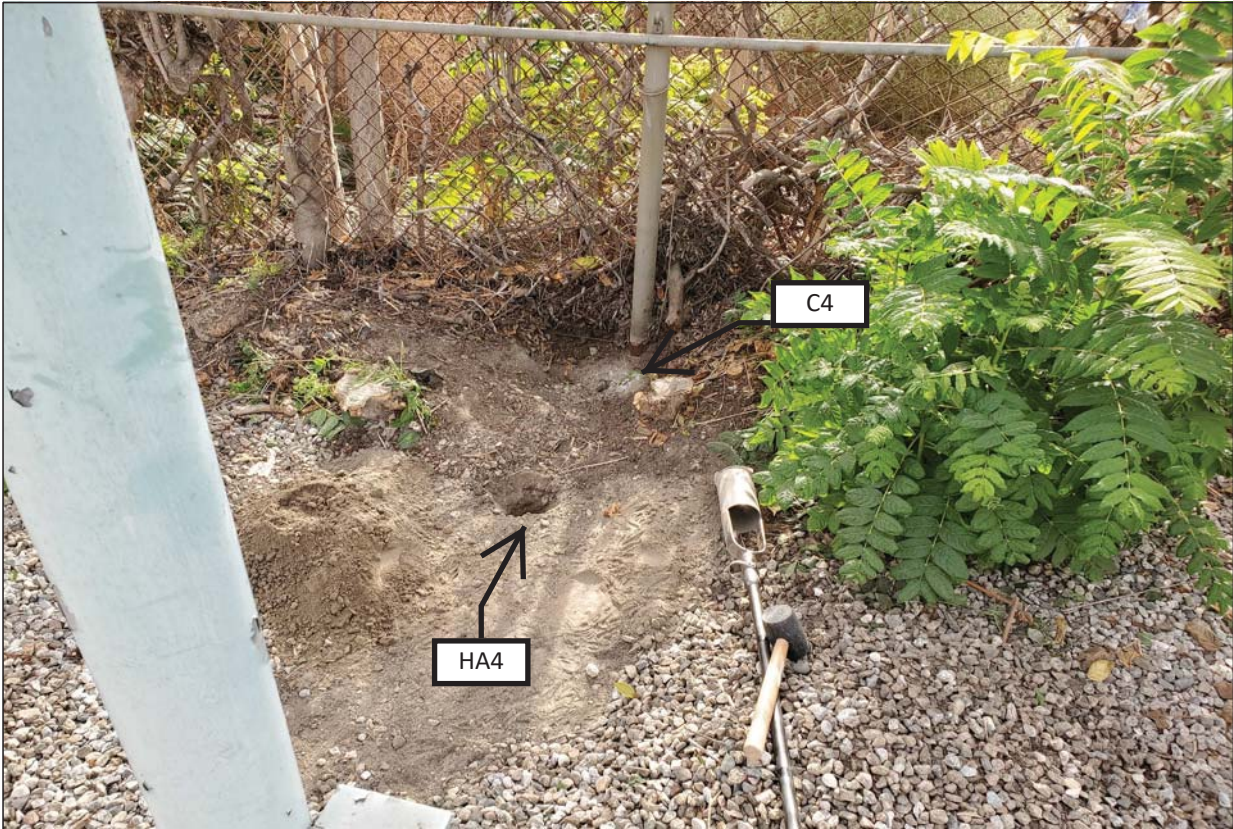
HAND AUGER LOCATION HA4 AND CONCRETE SAMPLE LOCATION C4
